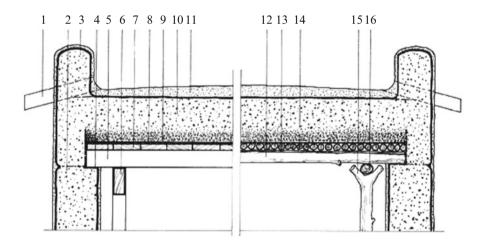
Traditional flat roofs using earth building materials, supporting structure, and basic design [74]. (1) Drain pipe made from locally available material, diameter approx. 75 mm, l=400–500 mm with sufficient wall clearance. (2) 250–300-mm-thick rammed earth wall plastered with stabilized soil, finished with limewash. (3) 200-mm-thick parapet wall, 300 mm high plastered with stabilized soil, finished with limewash. (4) Joist bearing surface with bituminous roofing felt. (5) 100×50 joists at 750-mm centers. (6) 150×75 crossbeams supported by 75×75 posts at 750-mm centers. (7) Ceiling boards. (8) Double layer of bituminous roofing felt/burlap mats dipped in bitumen. (9) Gravel-soil mix 50 mm. (10) Sand–soil mix up to 200 mm. (11) Stabilized soil screed 50 mm, 2 % sloped for drainage. (12–16) Log version
